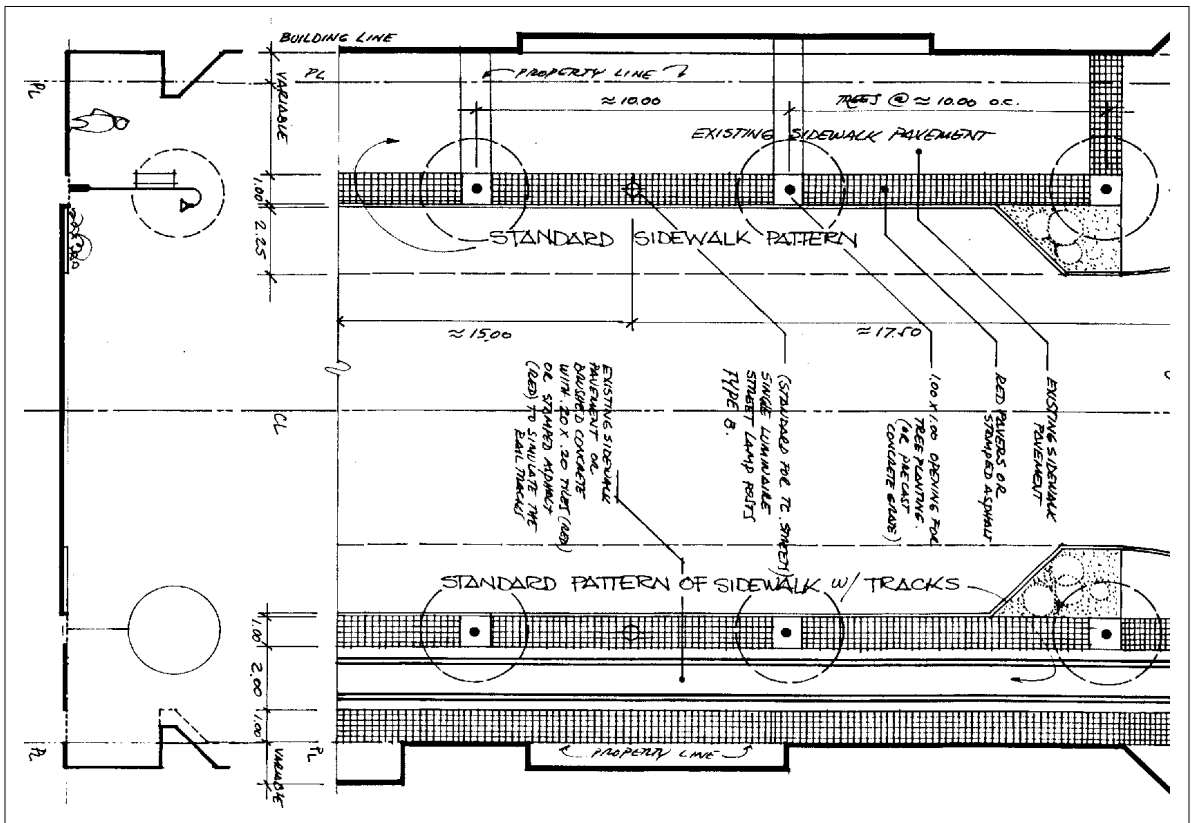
RIGHT OF WAY AND SIDEWALKS. "STATION WALK" and "KING STREET"
